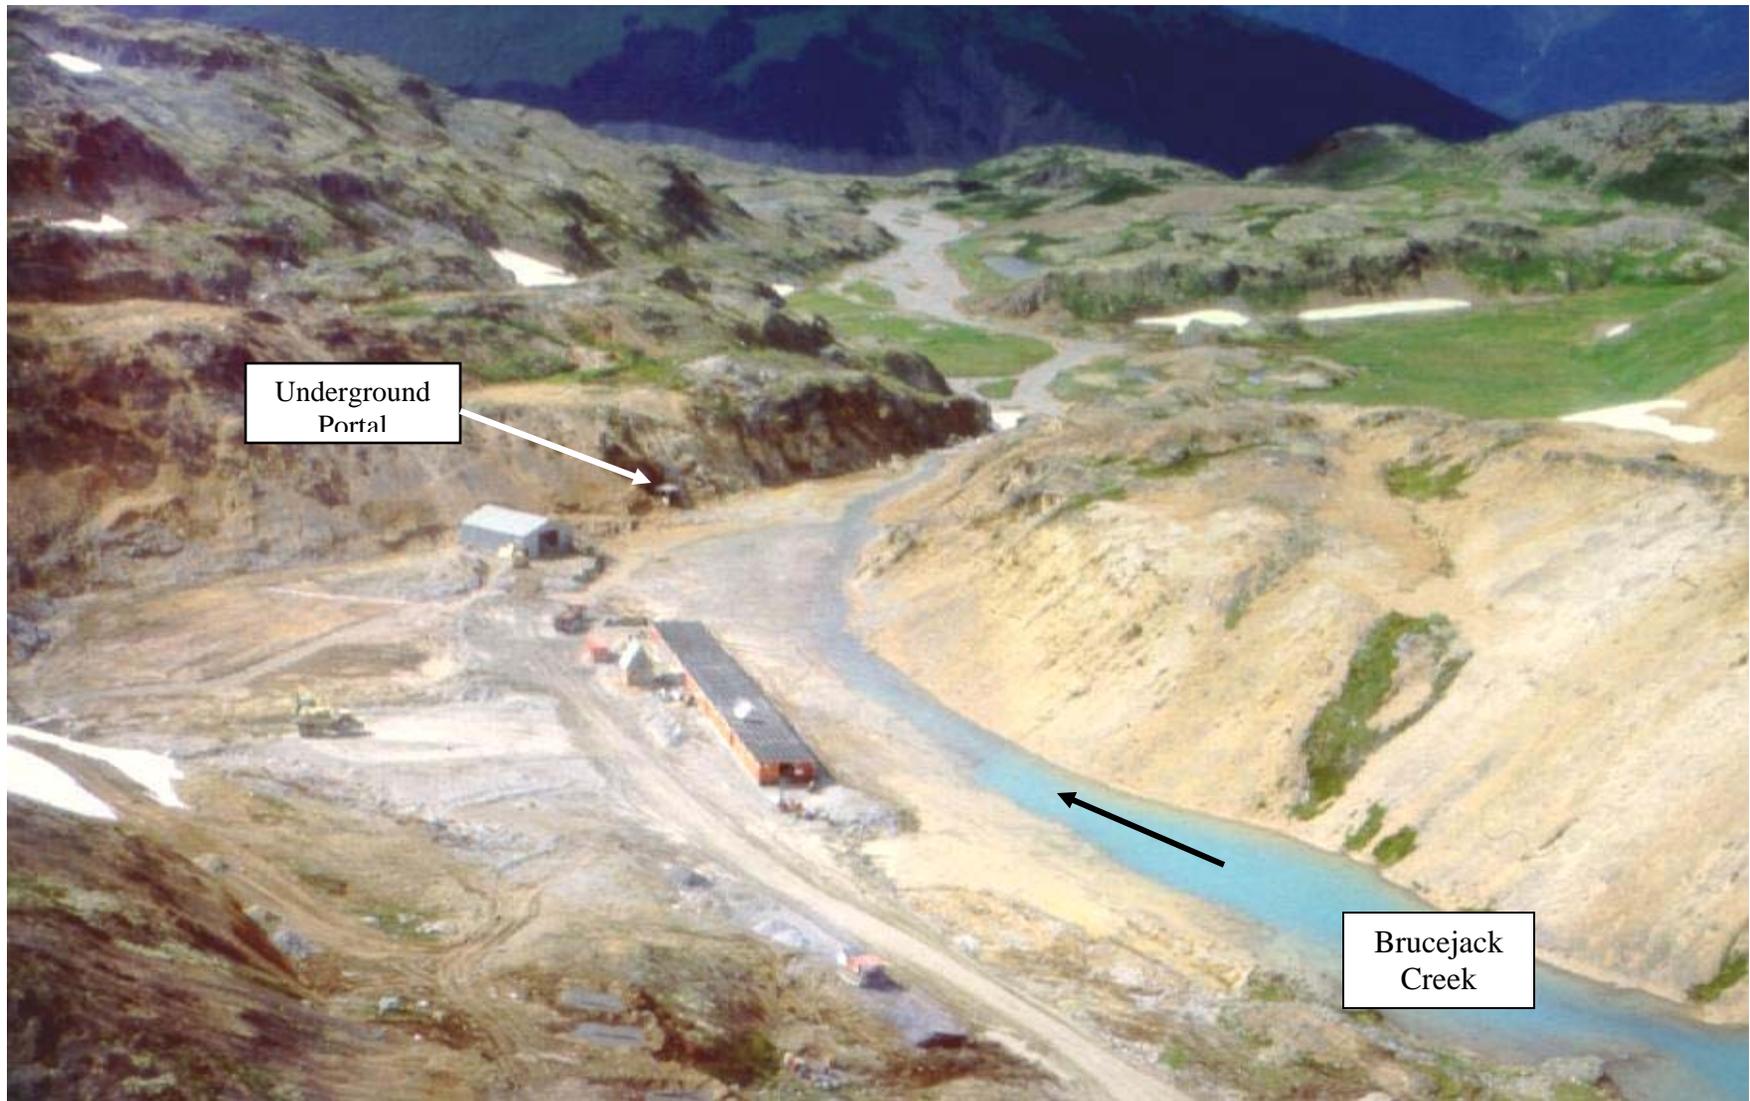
The Sulphurets Camp is located adjacent to Brucejack Creek, on a pad of waste rock excavated from the underground workings.
